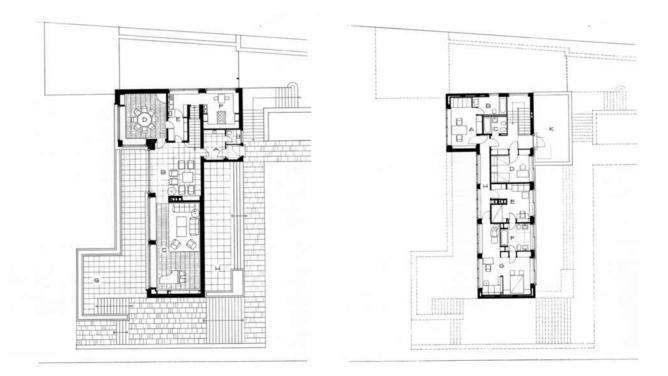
Mendelsohn House, Berlin-Westend, Am Rupenhorn 6, Erich Mendelsohn, 1928–30, plans of ground and first floor
